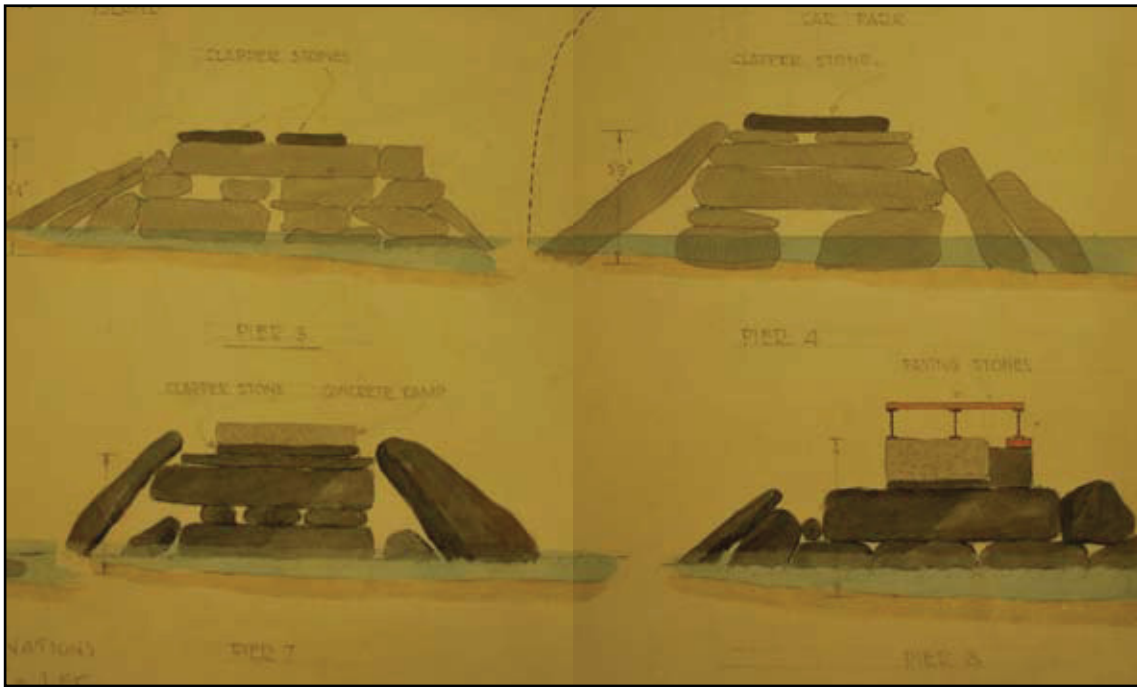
(above) Elevation drawings of piers (detail) which show the structure of Tarr Steps before it was swept away in the 1952 floods (SRO A\BHN/3)
